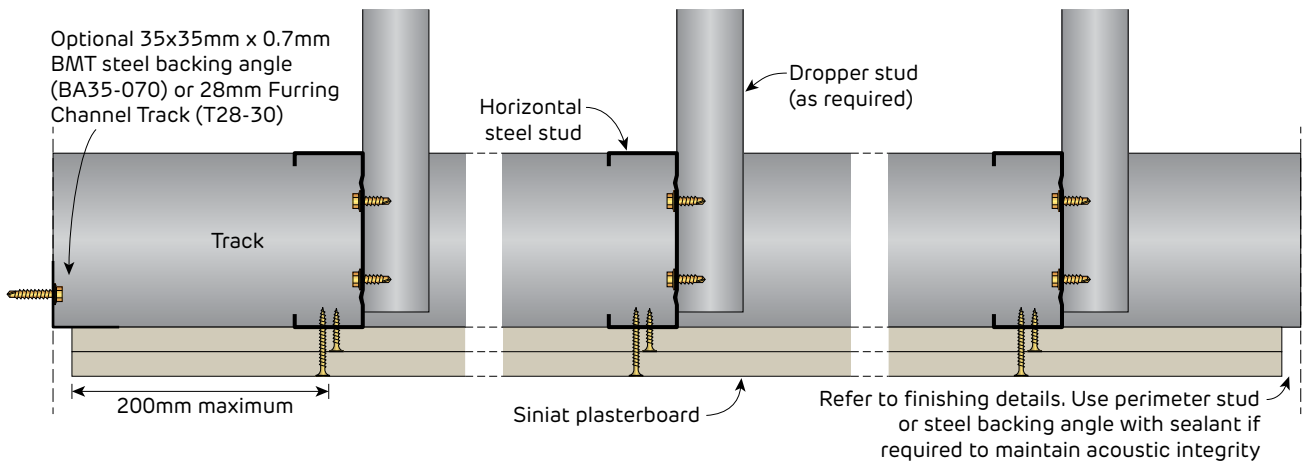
Stud Ceiling Type C1 - Edge Detail
